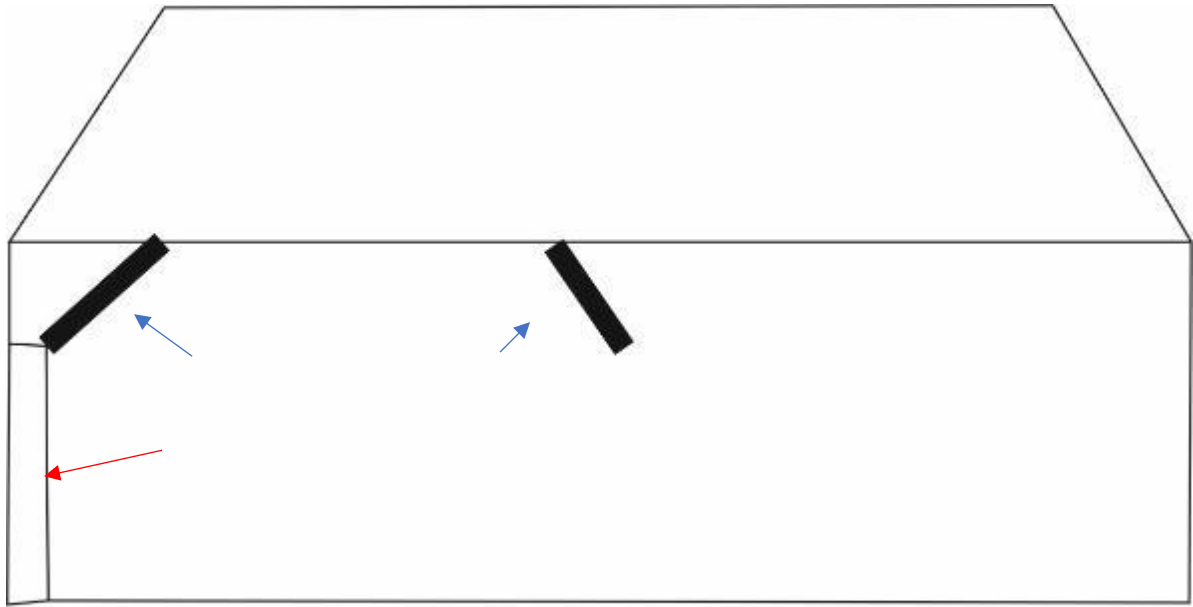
Boundary wall built against the face of the external South Eastern elevation of Building B.
